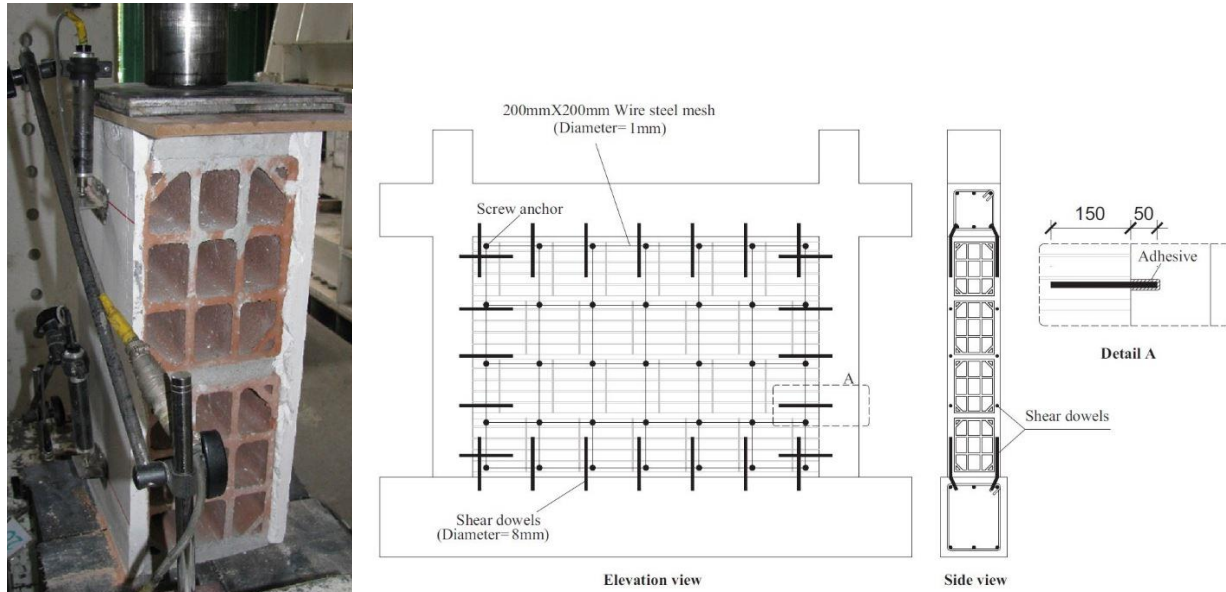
Left: ECC jacketed masonry. Right: Retrofit design of the infilled RC frames. (Sharbatdar and Tajari 2021)
